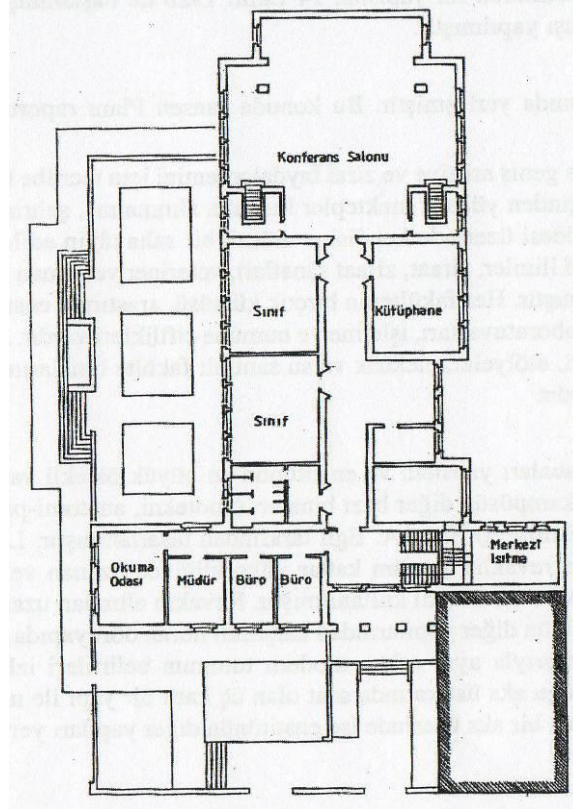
Plan drawing of Ticaret Lisesi (ASLANOĞLU, 2001:169)
